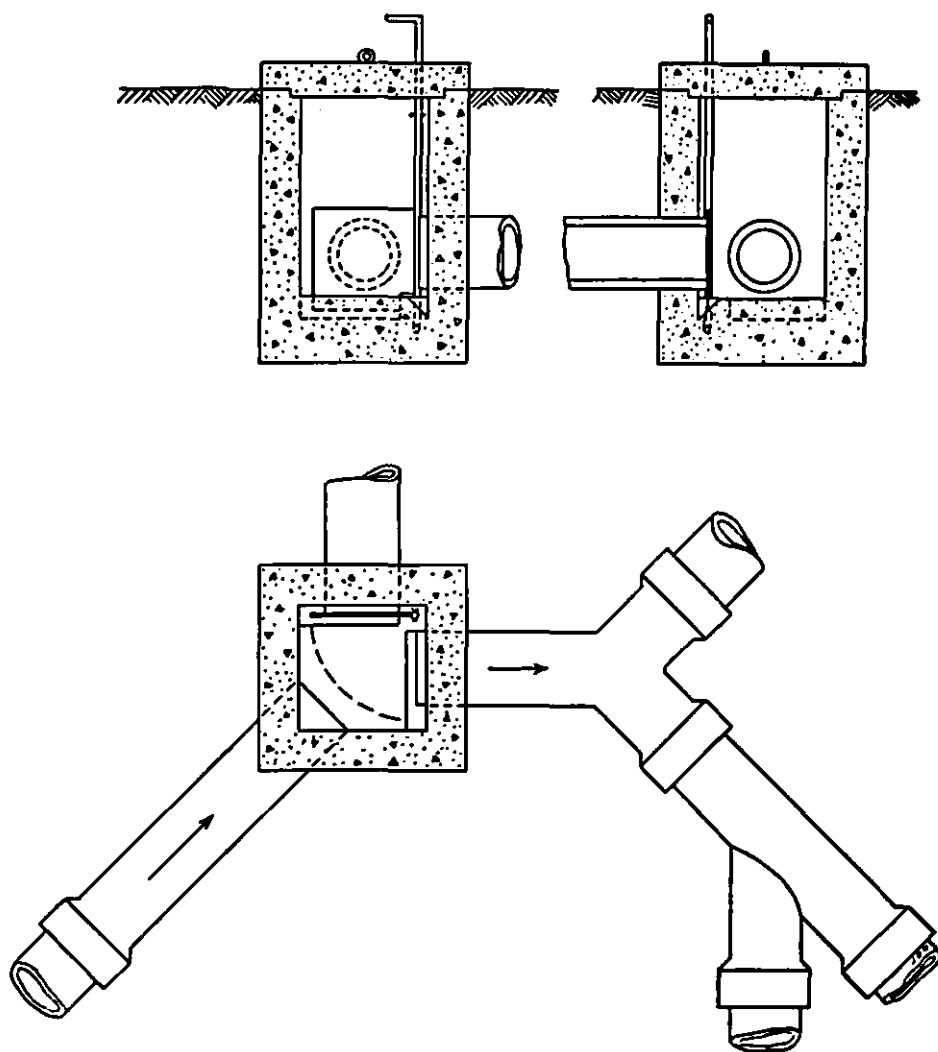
Plan and sectional elevations of sewage switch. Also showing use of “V” and “Y” sewer pipe specials to divide flow. A double Y with bell of straight part plugged can replace the V, but a box with a diagonal plate will make a better divider. Switch to be turned every 10 days or two weeks. The same results may be obtained with a similar box with the two outlets opposite and the inlet at the high side between them. A diagonal wooden paddle serves as a gate but the box top has to be removed when the flow is changed. See U.S. Farmers’ Bulletin 1950.
